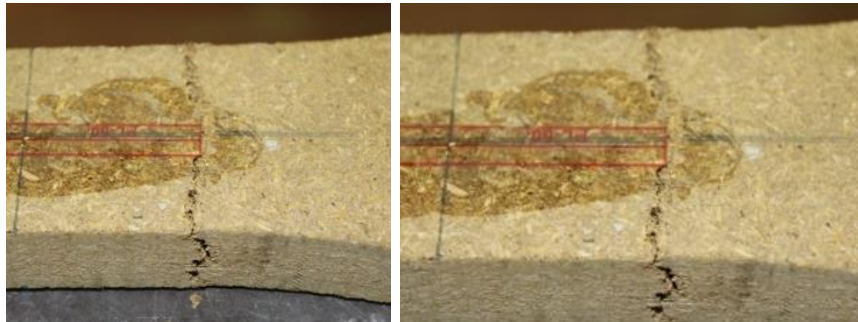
(Left) test piece 1 (Right) test piece 2; failure under axial tensile load
